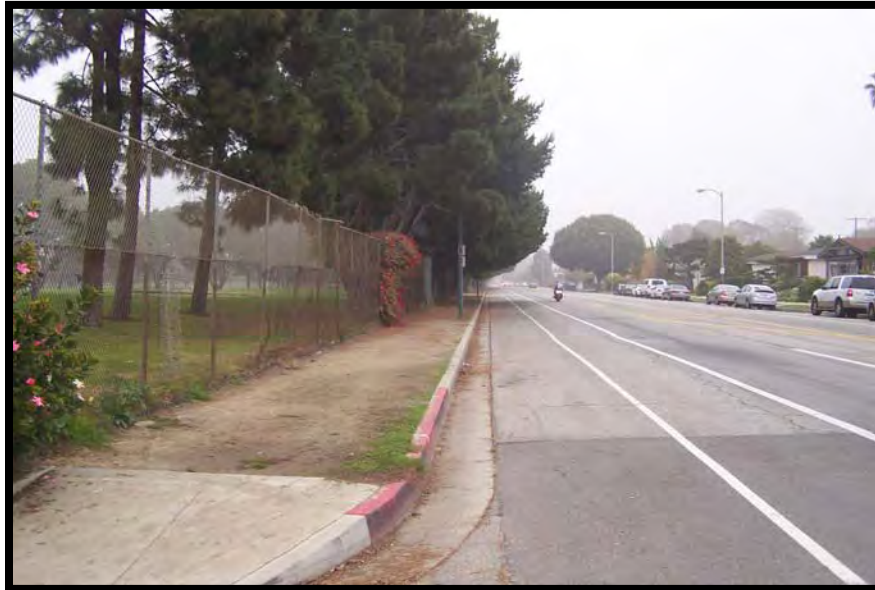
View to east from north side of Rose Avenue at Frederick Street, along proposed trench for force main (3) conduit in Rose Ave (Penmar Project Area).
